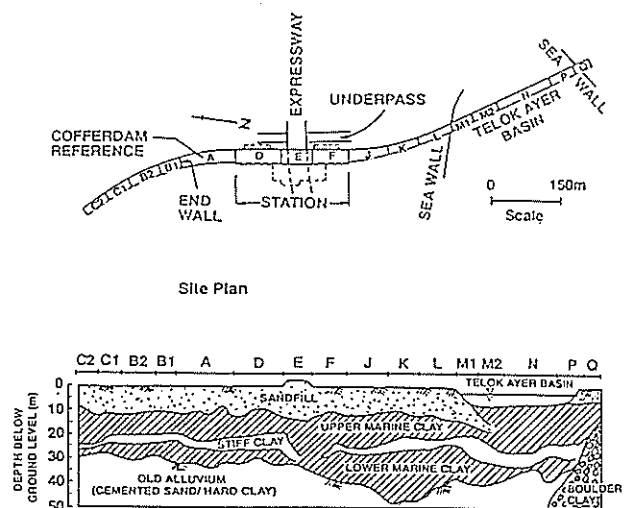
Site plan and generalized soil profile at Marina Bay (After Clark and Prebaharan, 1987)
